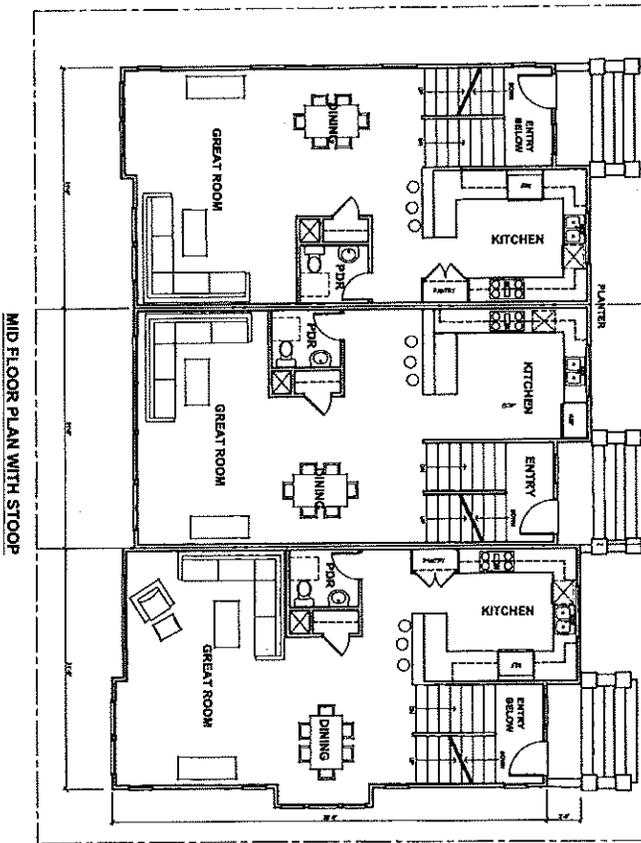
Exhibit AAA: South Block: Rowhouses (Lots 11-45) Middle Floor Plan w/Stoop
